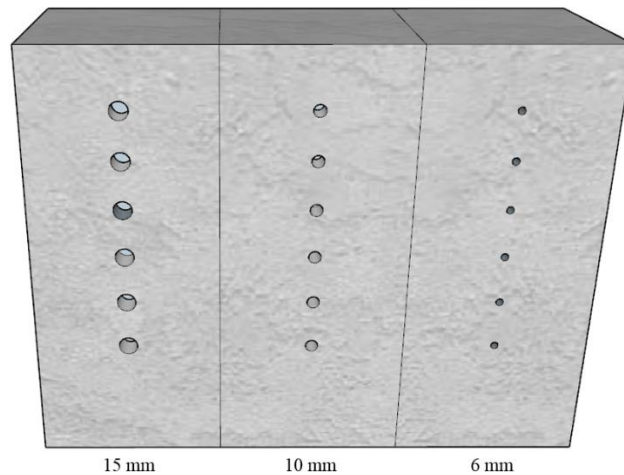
(a) illustrates the sketch of the proposed epoxy anchors. Epoxy anchors are cured as hardened epoxy resin in the concrete pre-drilled holes. The interfacial bond strength can be enhanced by the epoxy bonding and interlocking action between epoxy and concrete. The preparation of the epoxy anchors included drilling the designed holes on the concrete block by using a hammer drill as shown in Figure 8-1 (b), then filling the holes with epoxy resin as shown in Figure 8-1 (c), and finally bonding BFRP sheets. Prior to preparing epoxy anchor, the concrete substrates were roughened by a needle scaler to remove the weak layer of mortar. The epoxy anchors used in this chapter had various diameters ( $d_i$ ) of 6 mm, 10 mm, and 15 mm. The embedment depth ( $d_e$ ) of the anchor was kept unchanged and set as 20 mm, which was less than the thickness of the concrete cover. The distance between anchors ( $L_e$ ) was set as 40 mm, which was less than the effective bond length (i.e. 50 mm in this chapter). The FRP composite was formed by three layers of BFRP sheets to avoid FRP rupture upon loading. This epoxy anchorage system was proposed to (a) enhance the cracking-resistance of the concrete substrate; (b) eliminate or delay the interfacial cracking; and (c) increase the effective interfacial shear stress transfer length.
